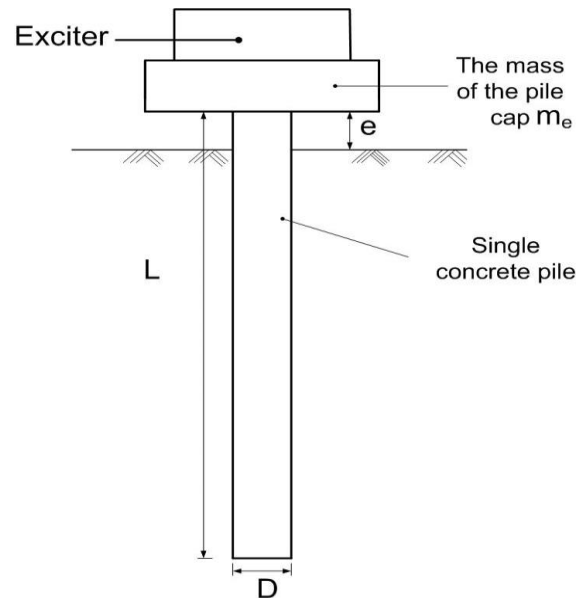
Single concrete pile subjected to a lateral load (El-Marsafawi, 1992)
